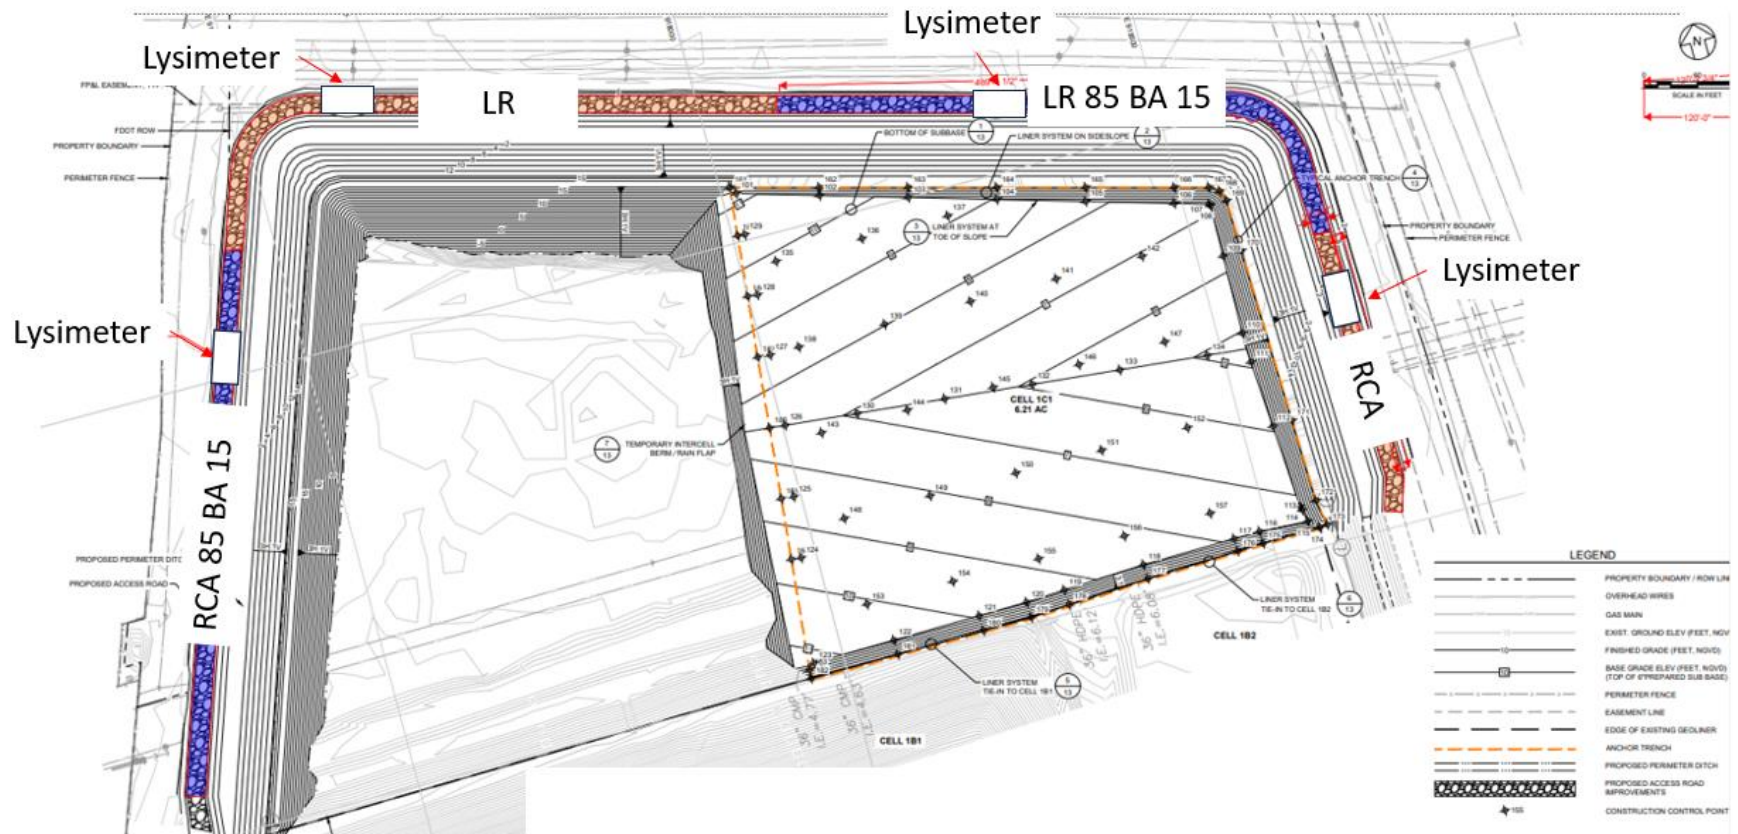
Proposed pilot road configuration and conceptual design drawings.
